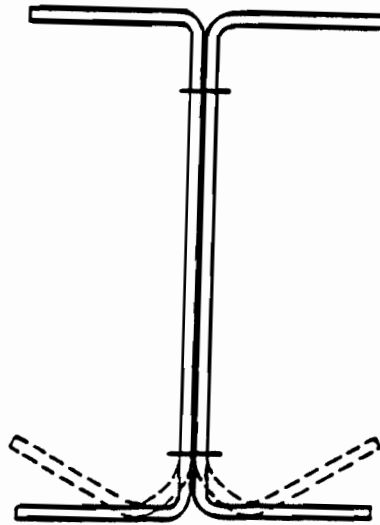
Sketch Showing Failure at Web-Flange Junction
